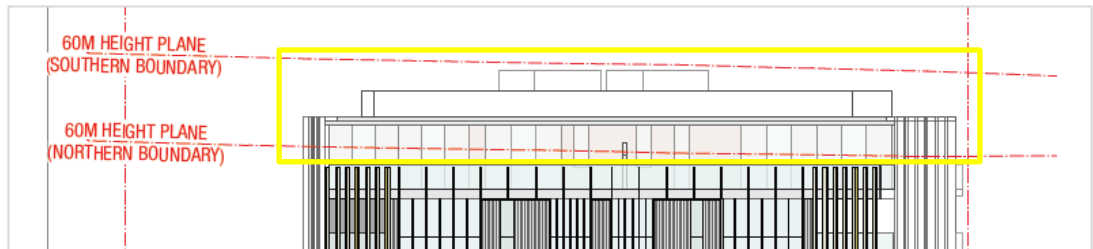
Extract of the Northern Elevation, contravention highlighted in yellow (Source: UP Architects/Kann Finch)
